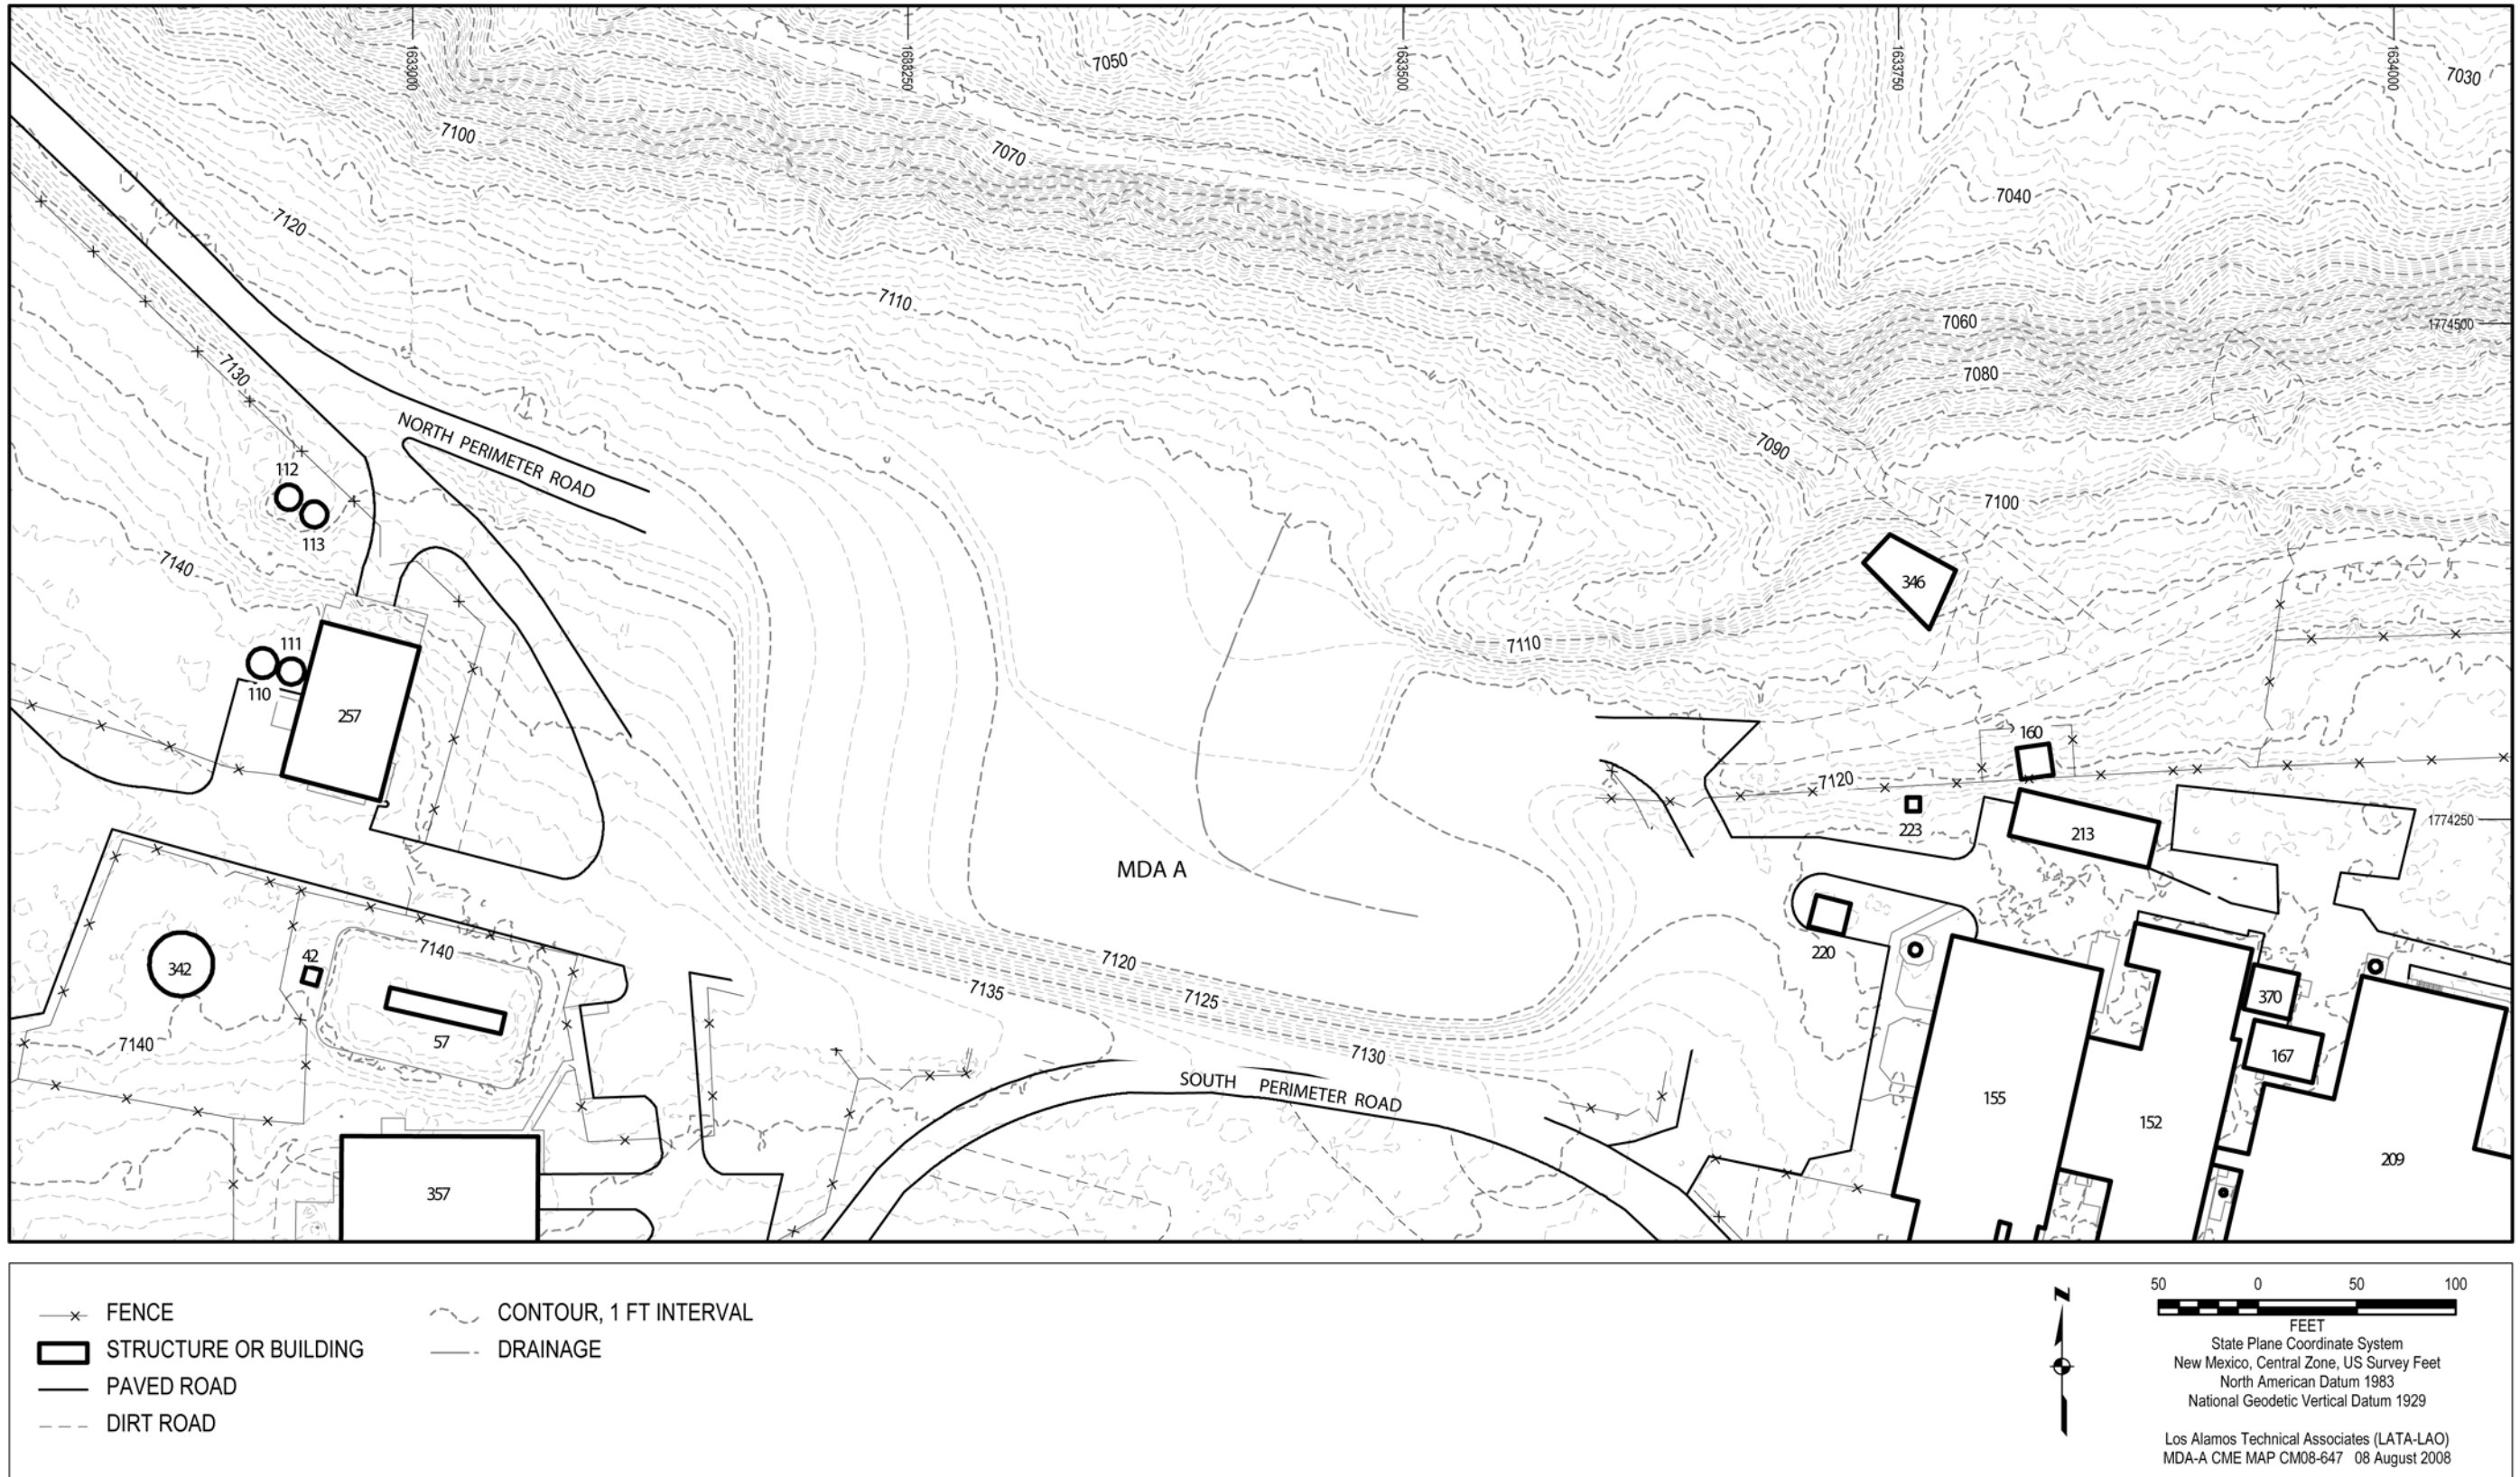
Alternative 3, full waste removal final grading plan
